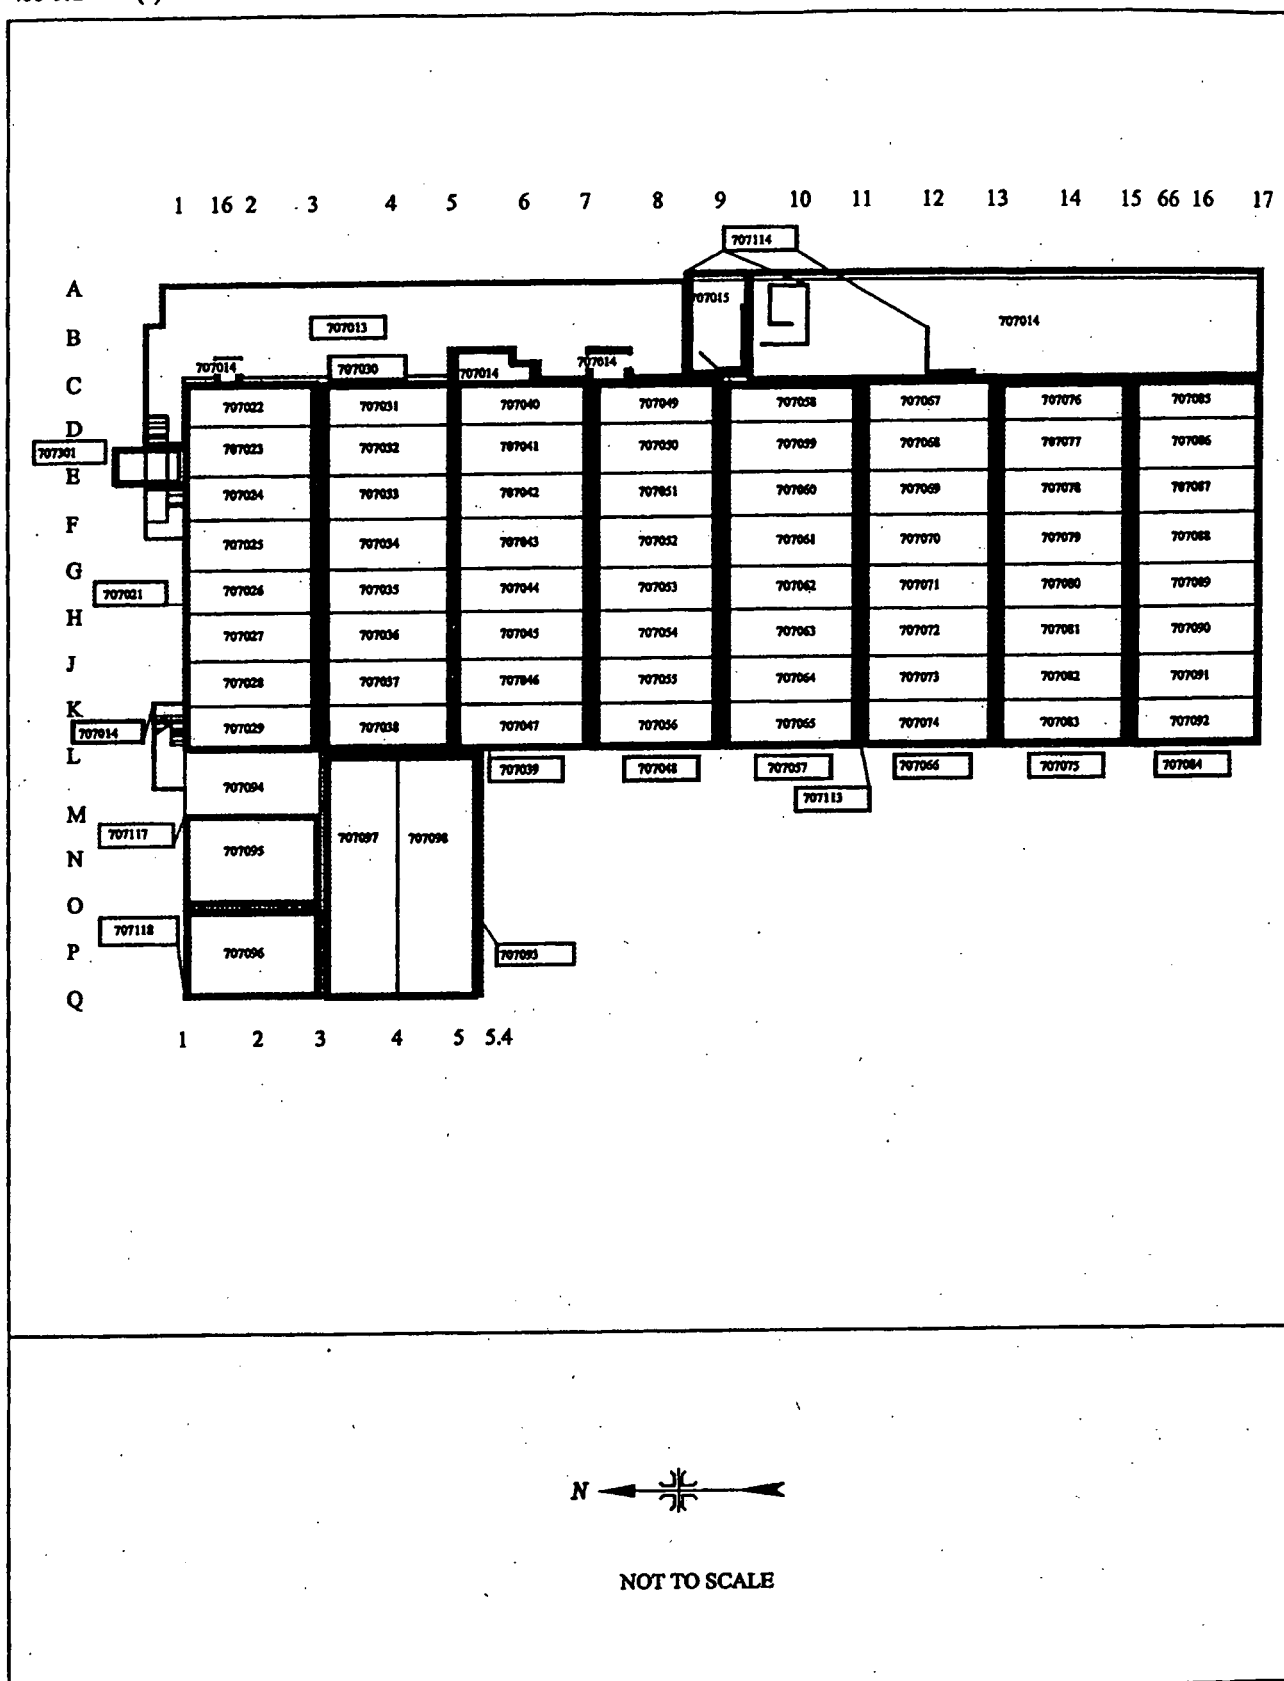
Plot Plan of the First Floor Building 707 Survey Units
